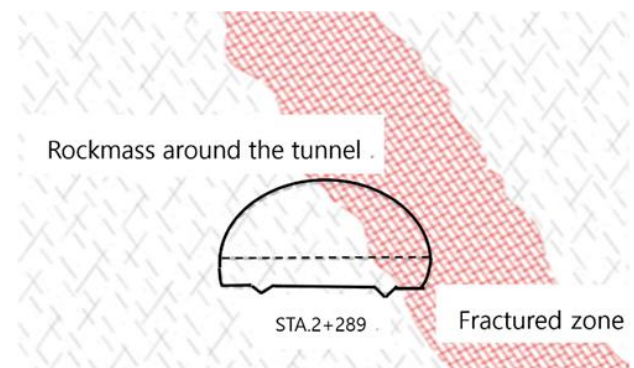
Shape of fractured zone (before tunnel excavation)
